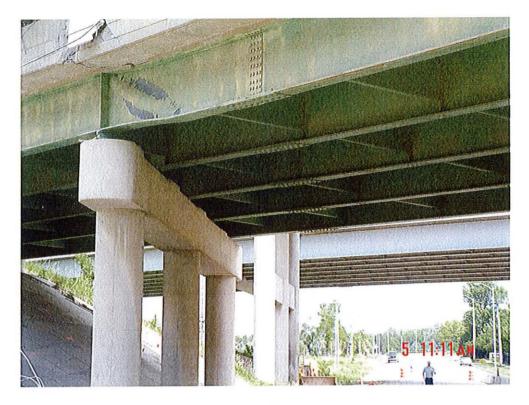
(damage to lower bridge girder framing due to upper bridge collapse)
